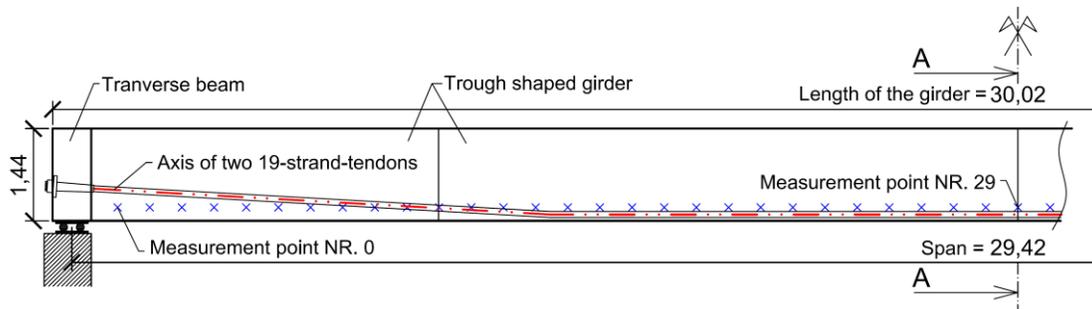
Schematic sketch of bridge with trough shaped precast girders.
